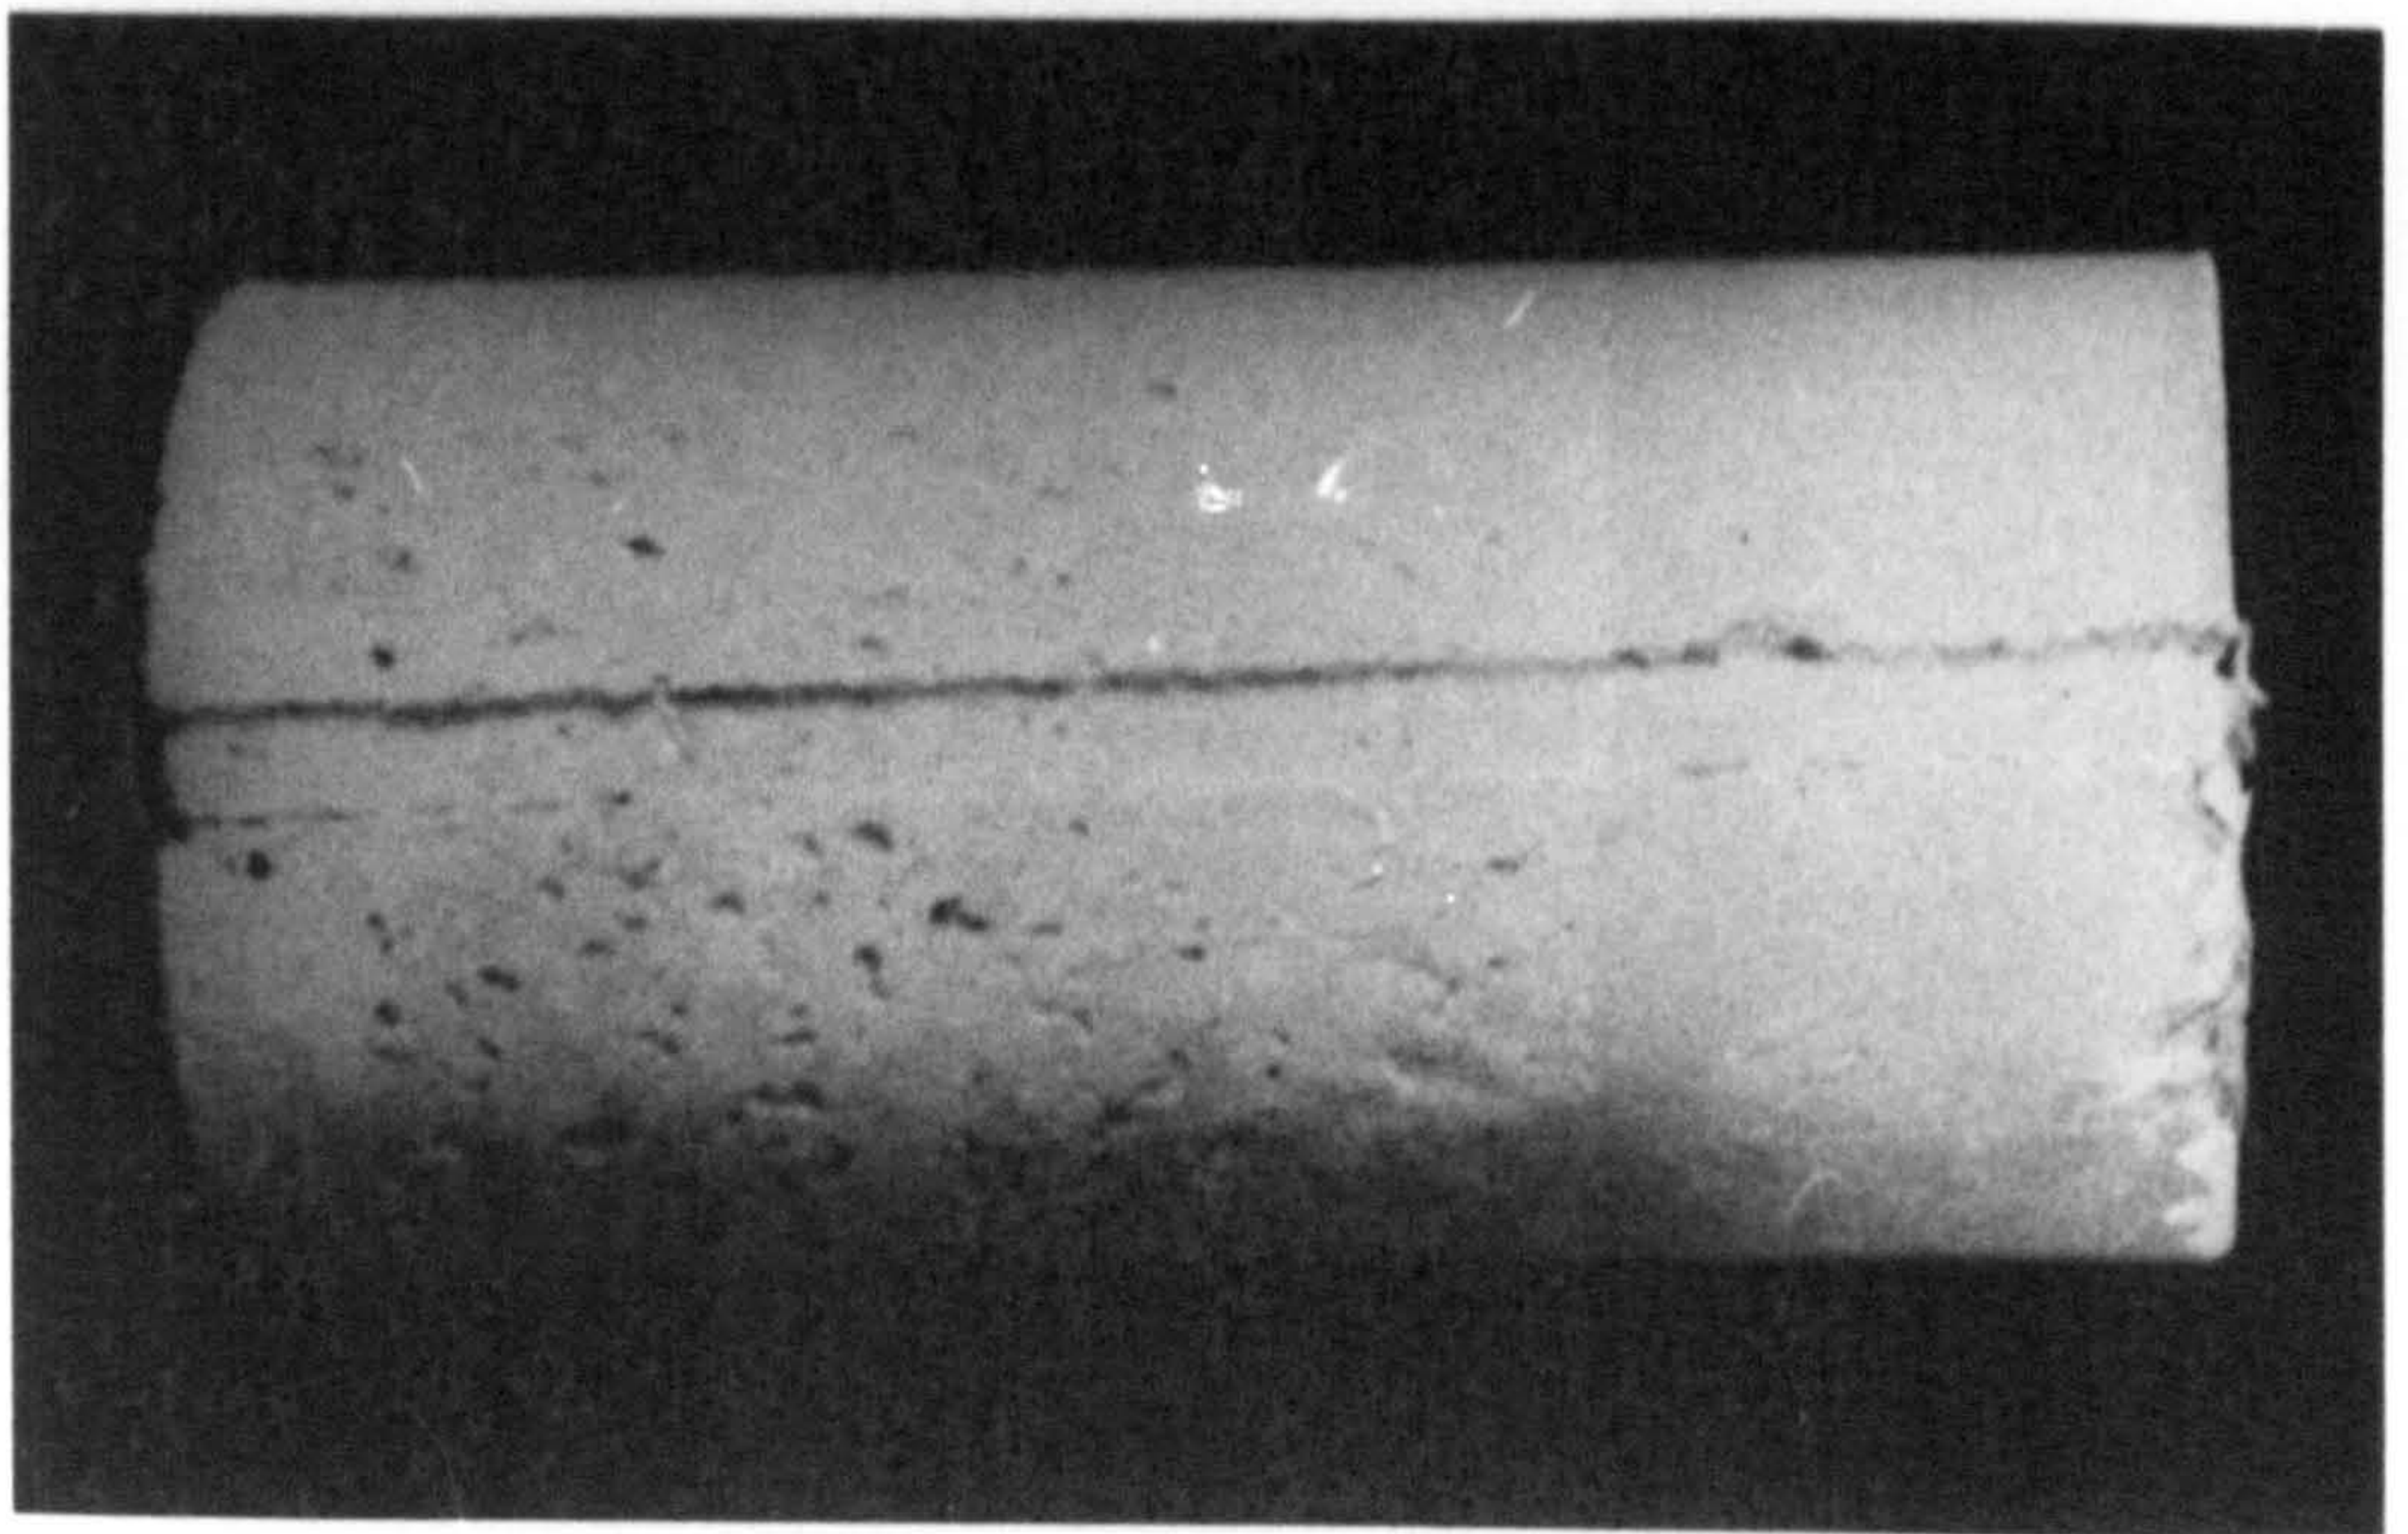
FIBRE CONCRETE CYLINDER AFTER TESTING
